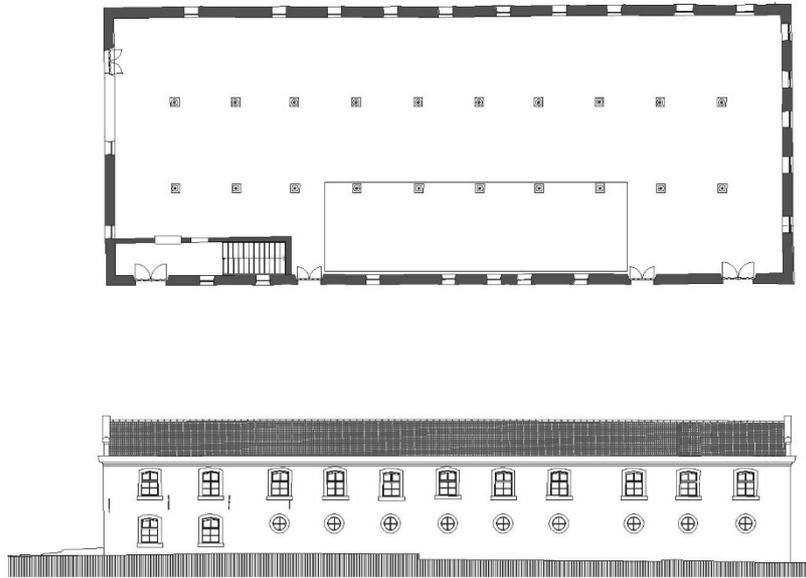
The Plan Layout and the Façade of Mess Hall Building
